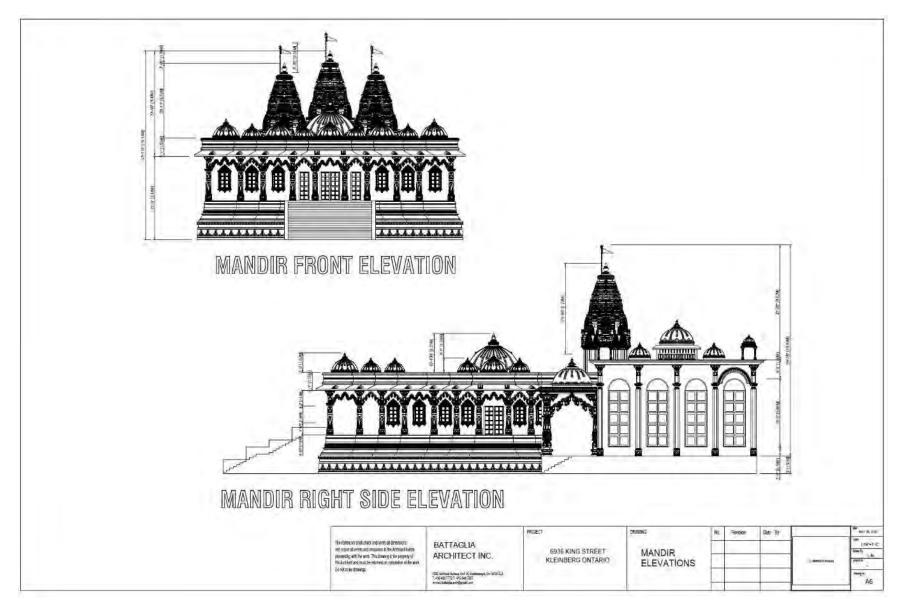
Proposed Mandir front and right-side elevation (Battaglia Architects Inc.)
